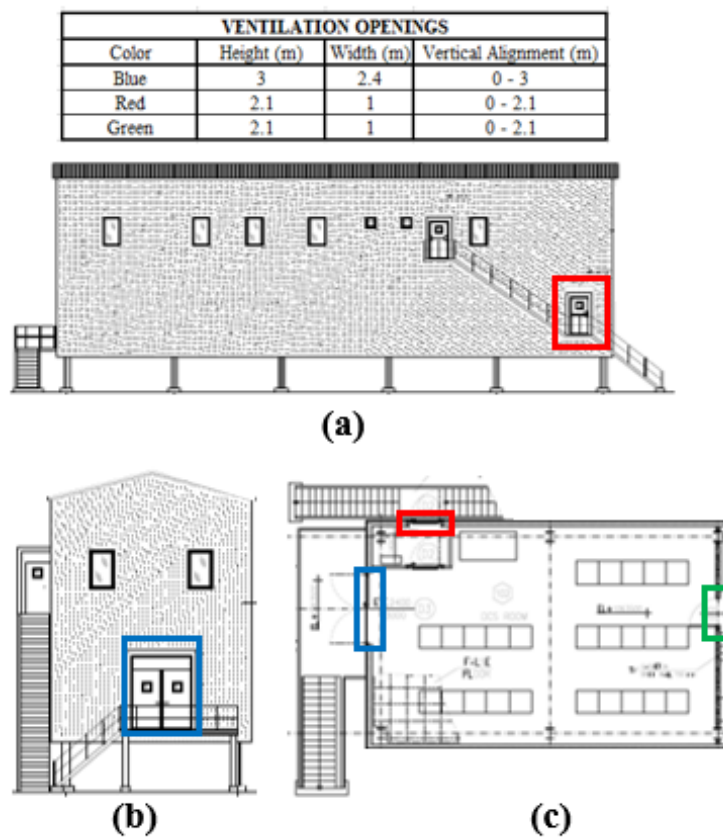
Architectural Drawings of the Building with Highlighted Ventilation Openings (a) 1 Axis View (b) F Axis View (c) Fire Compartment Plan View.
